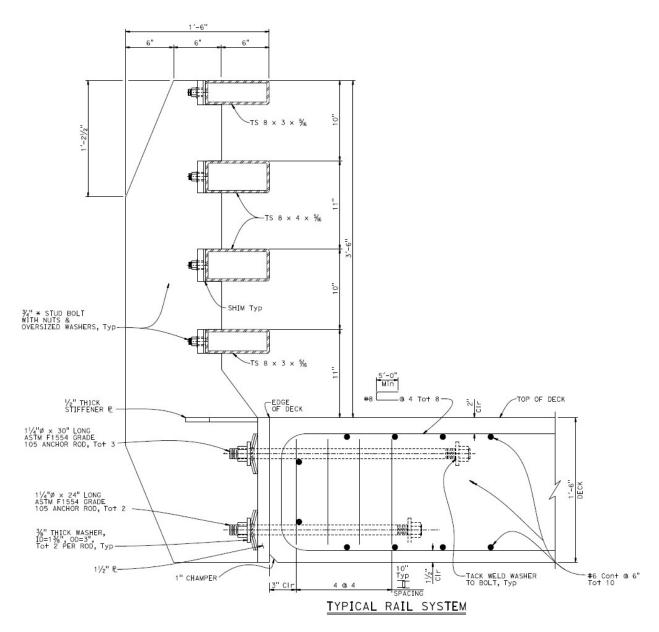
CA ST-70SM Side Mounted Bridge Rail Typical
